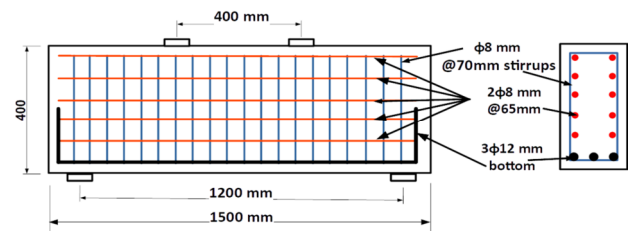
Schematic diagram of beam dimension and reinforcement details.
